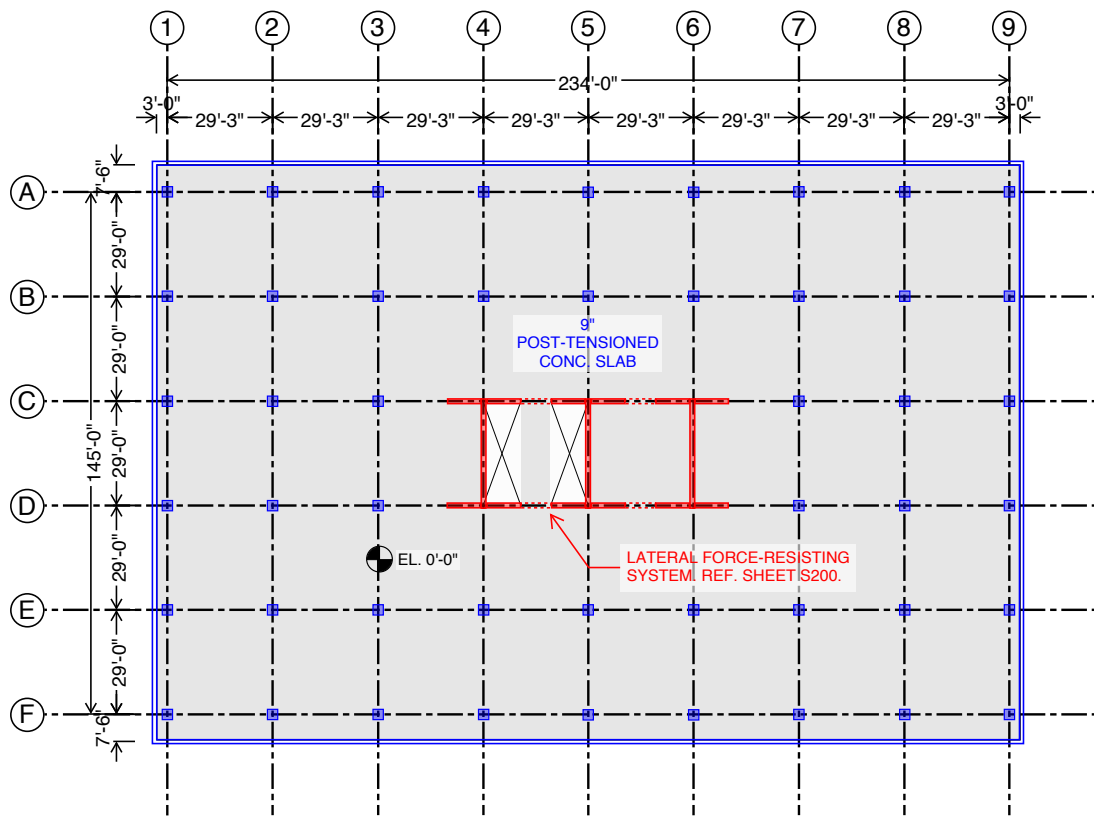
Ground floor plan for the large reinforced concrete office building
